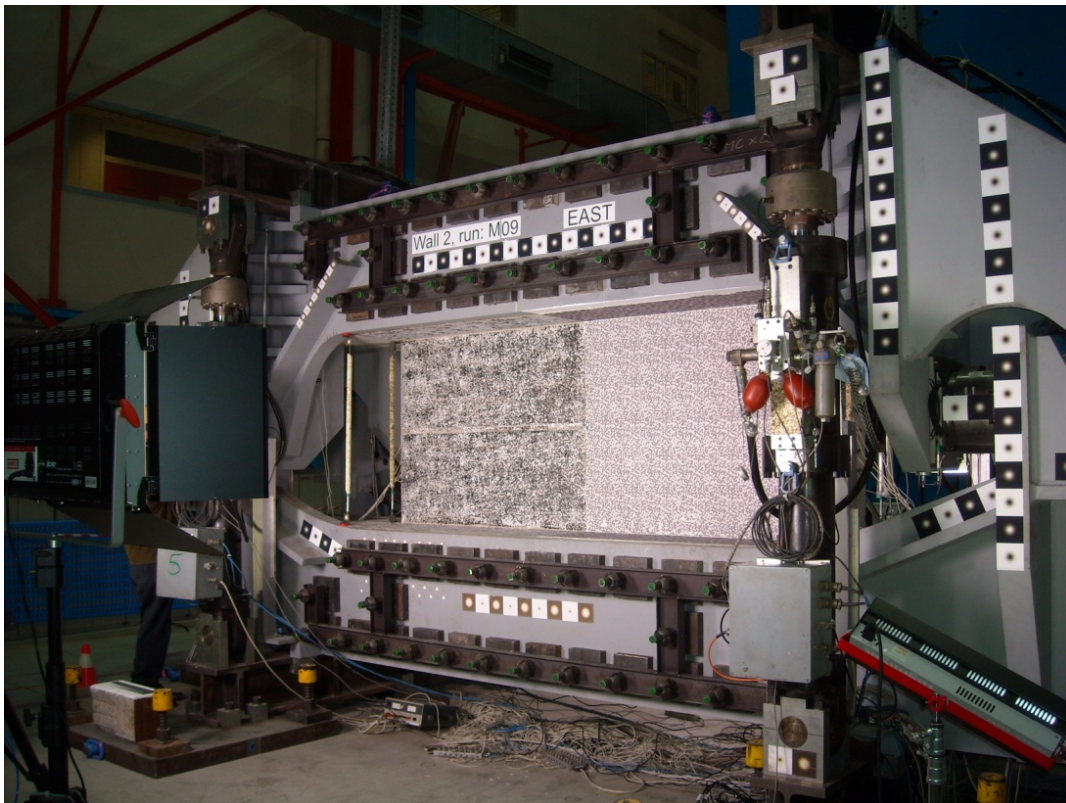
The reinforced concrete shear wall testing at the ELSA laboratory (IRIS project)
